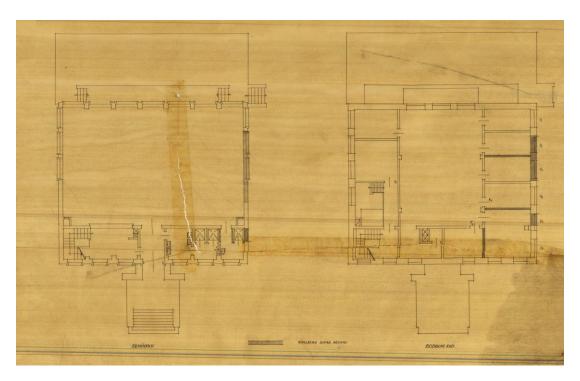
Proposal of an additional building on the north of the workers club, the ground and basement floor plans indicating the walls that would have been removed, Construction Section in General Directorate of TEKEL, 24.06.1947 (Source: TTA Archive)
